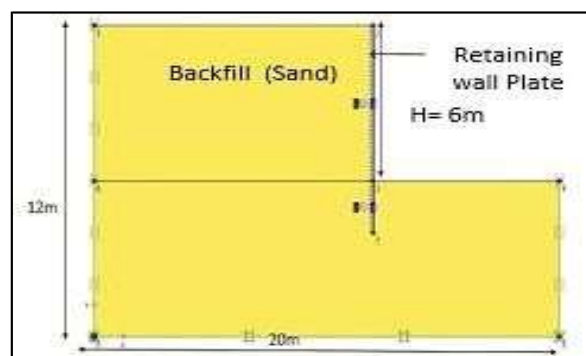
Geometric Model of Retaining wall and Backfill in Plaxis 2D for static condition
